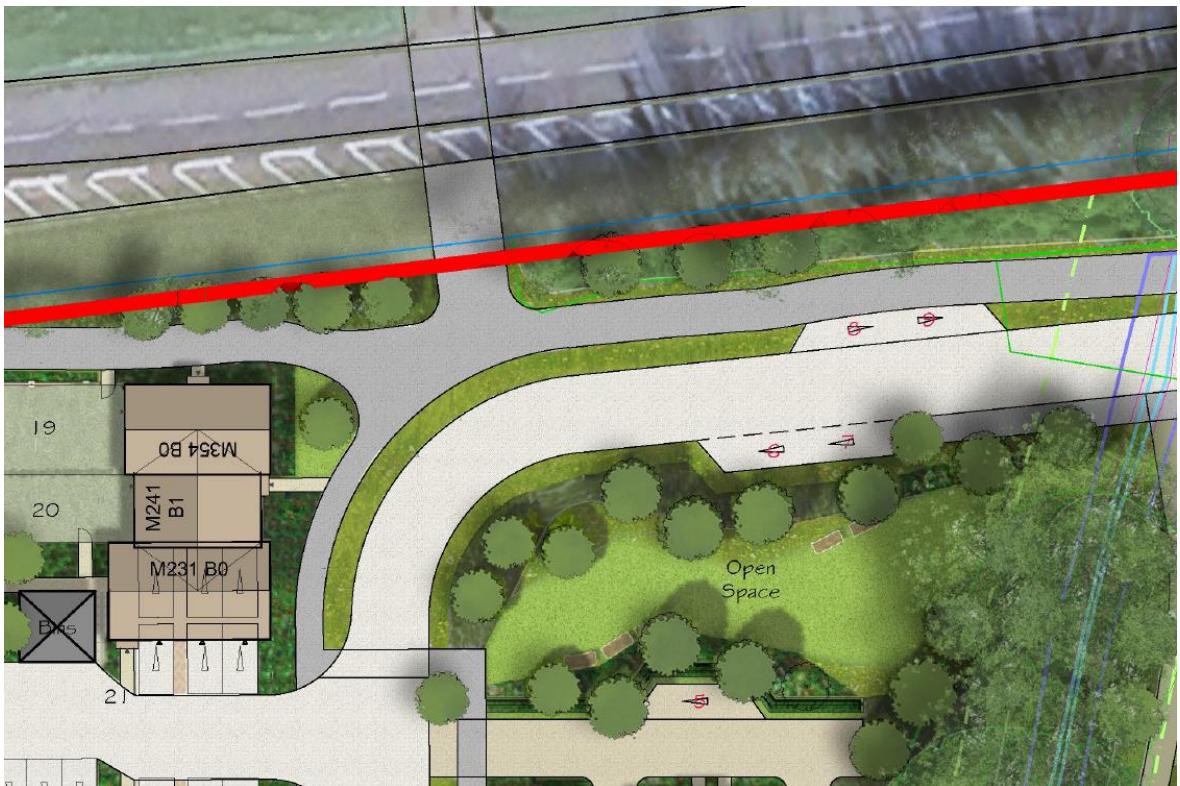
Proposed Area of Open Space and Connectivity to the North
